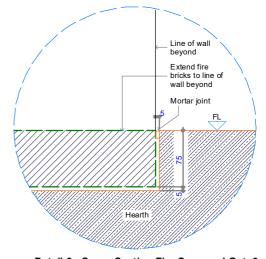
Cross Section Fire Surround Opt. 3 Timber Cavity
